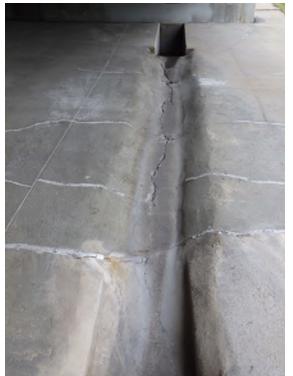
SW slope paving drainage trough, closer view of wide cracking
